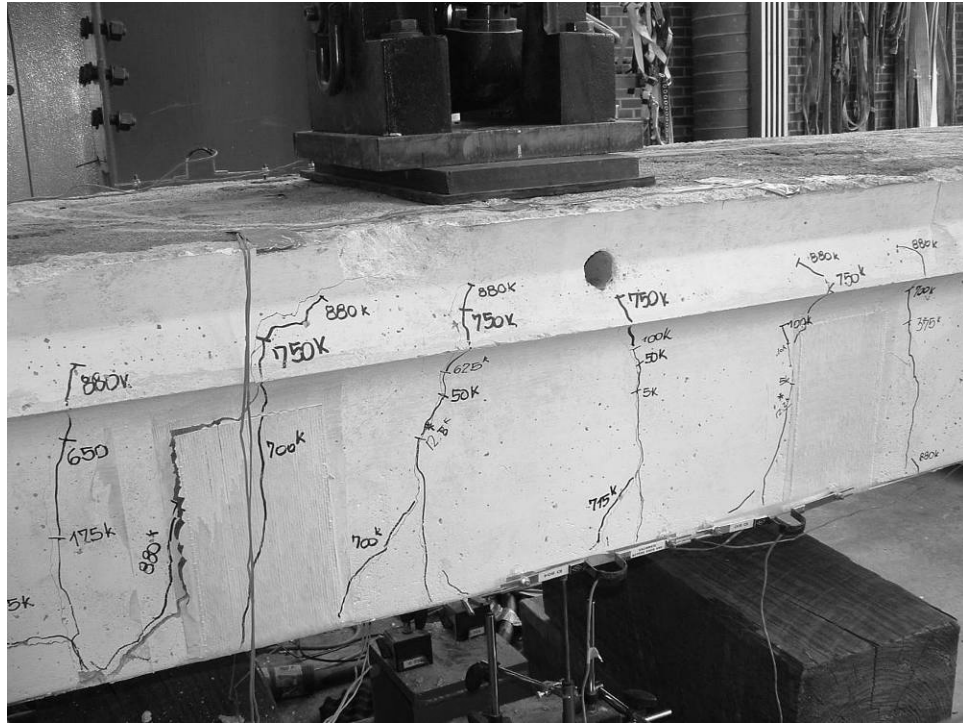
Girder EB1F after failure due to rupture of prestressing
